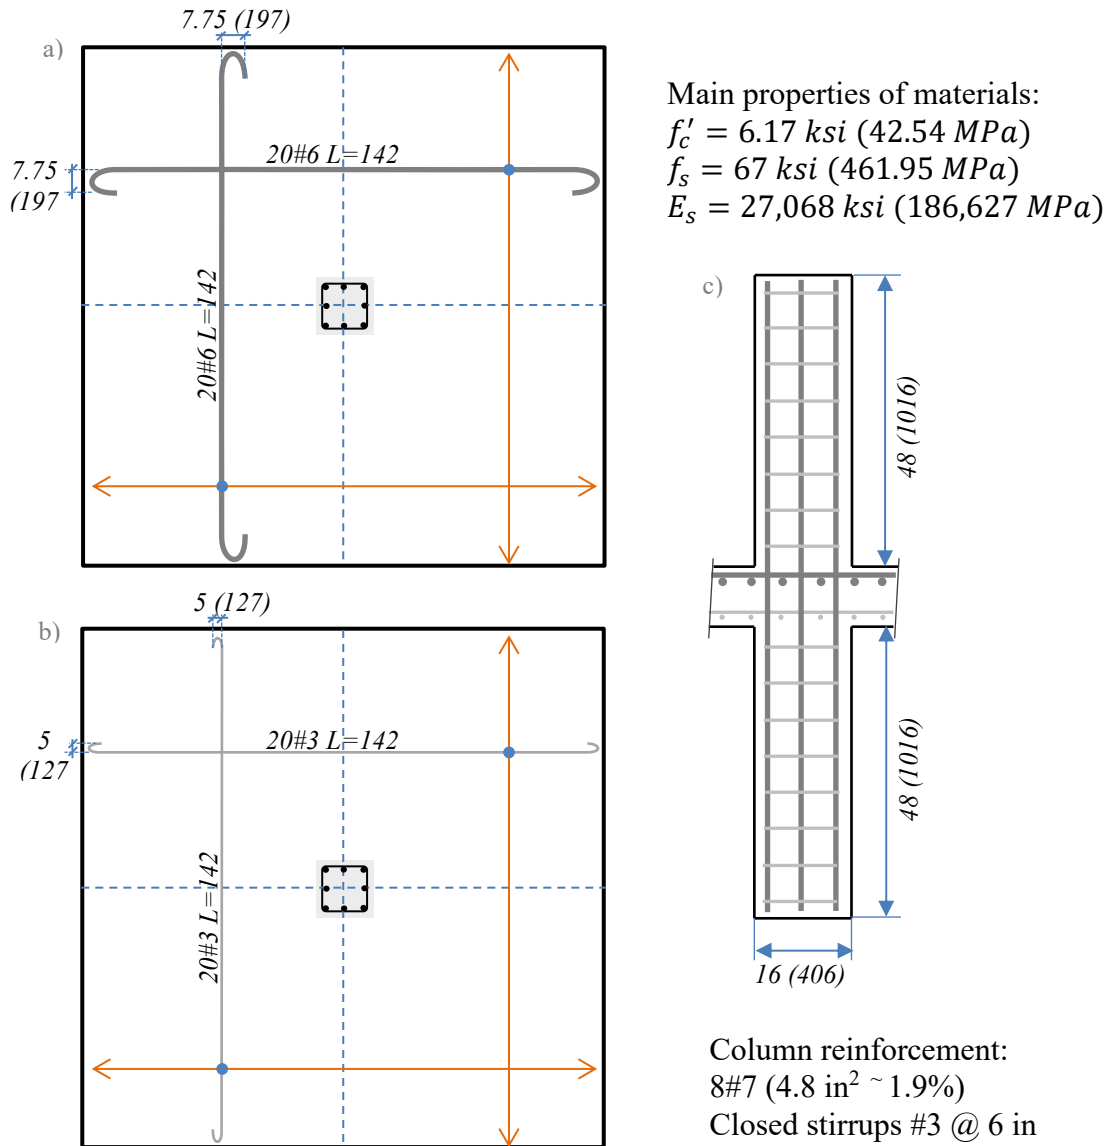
Main characteristics of specimen C-0.7. Detailing of: a) Top reinforcement; b) Bottom reinforcement; c) Column reinforcement.
